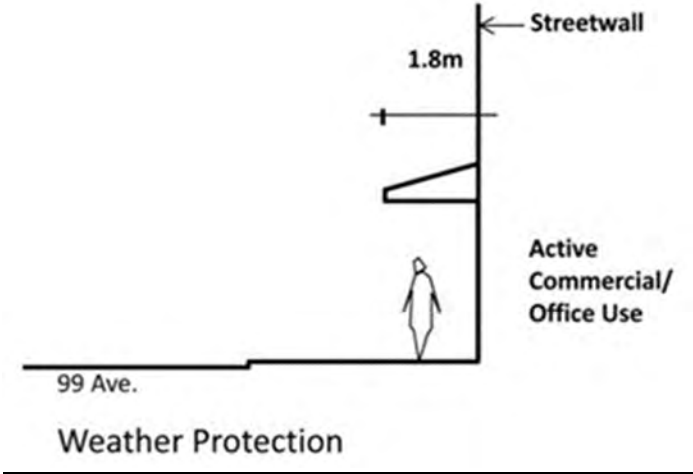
Core Commercial District - Downtown Ground Floor Frontage
